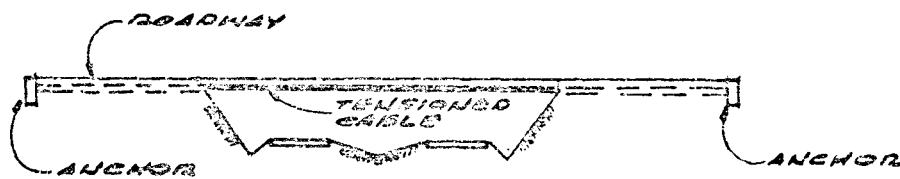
TENSIONED CABLE BRIDGE CONCEPT
